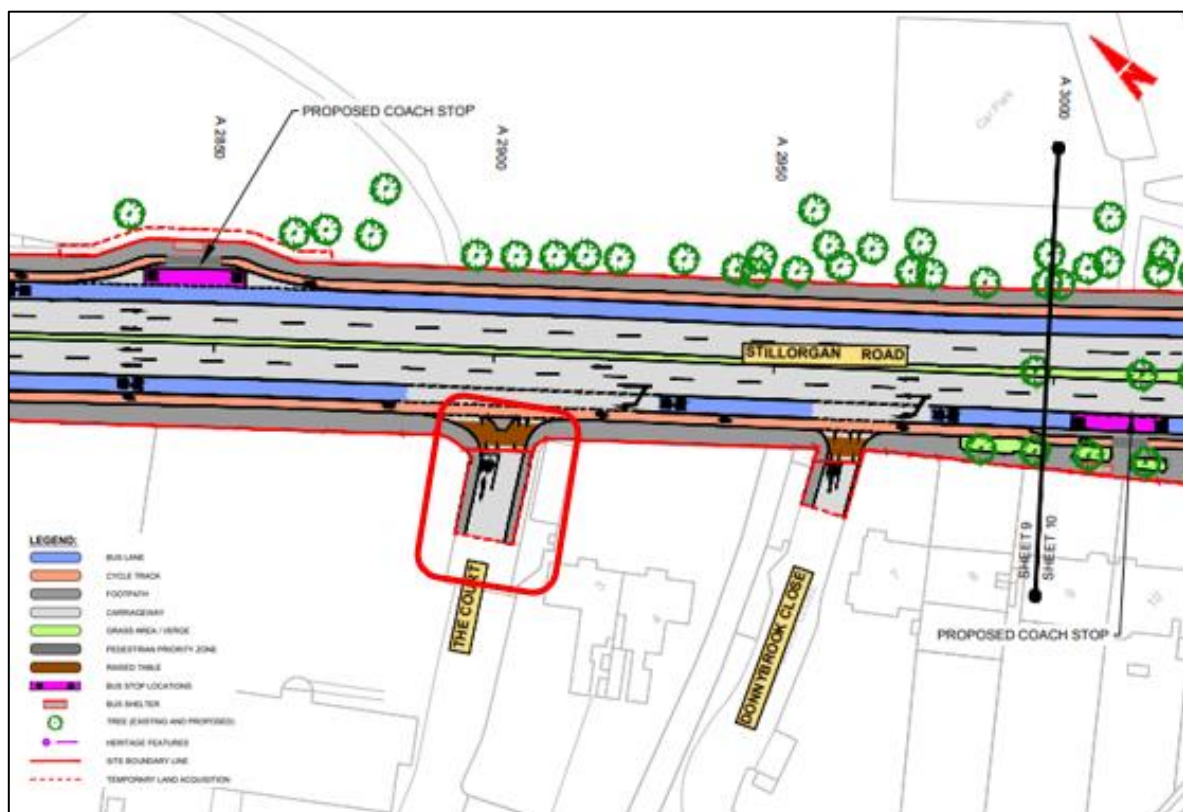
Extract from General Arrangement Drawing at Stillorgan Road (Sheet 09)
